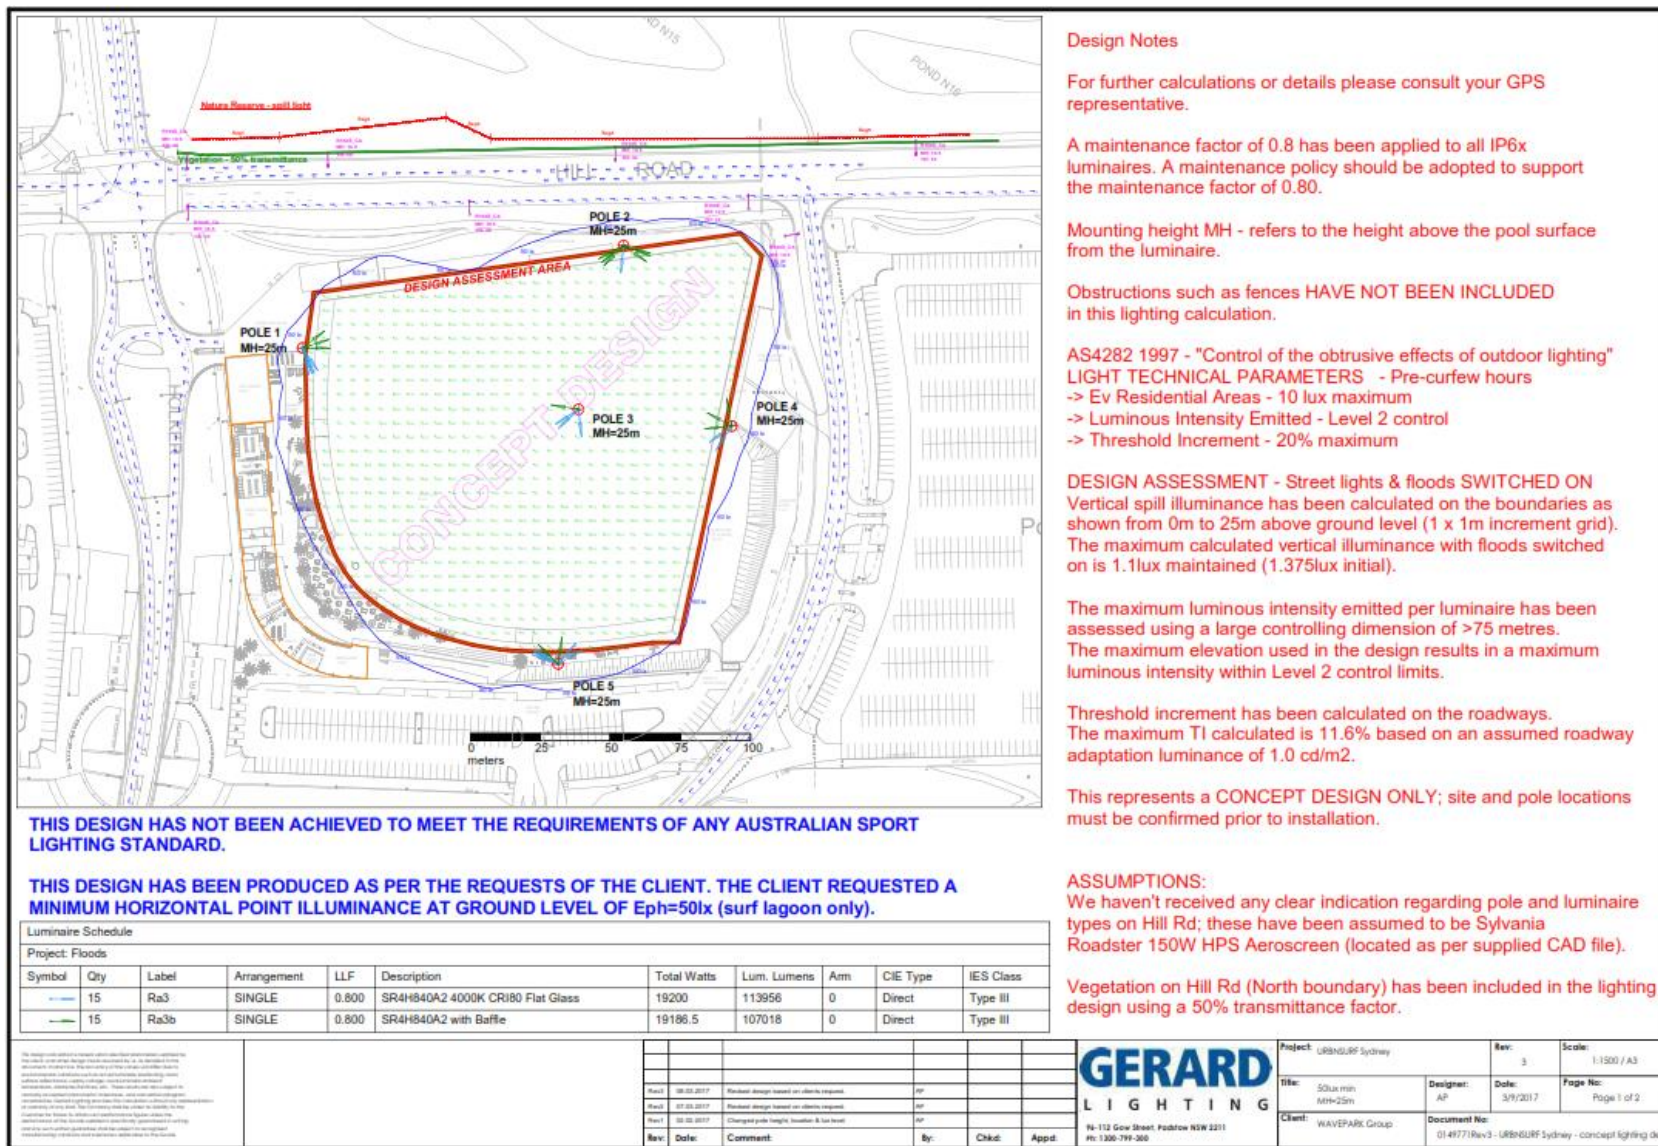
Design assessment area and concept design notes for lighting plan for proposed Wave Park
